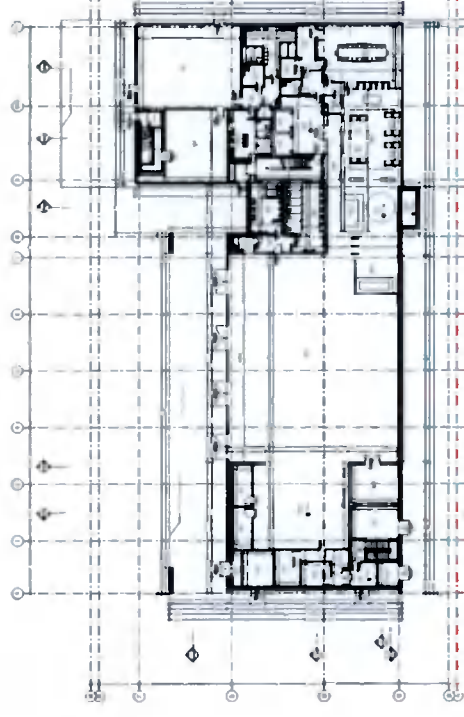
C.A.B. Proposed Ground Floor Plan (image updated)
